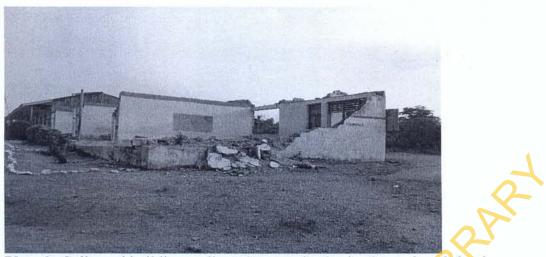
Collapsed building walls at Community Senior Secondary School, Olomi, Oluyole Local Government Source: Authors' Survey, 2014
